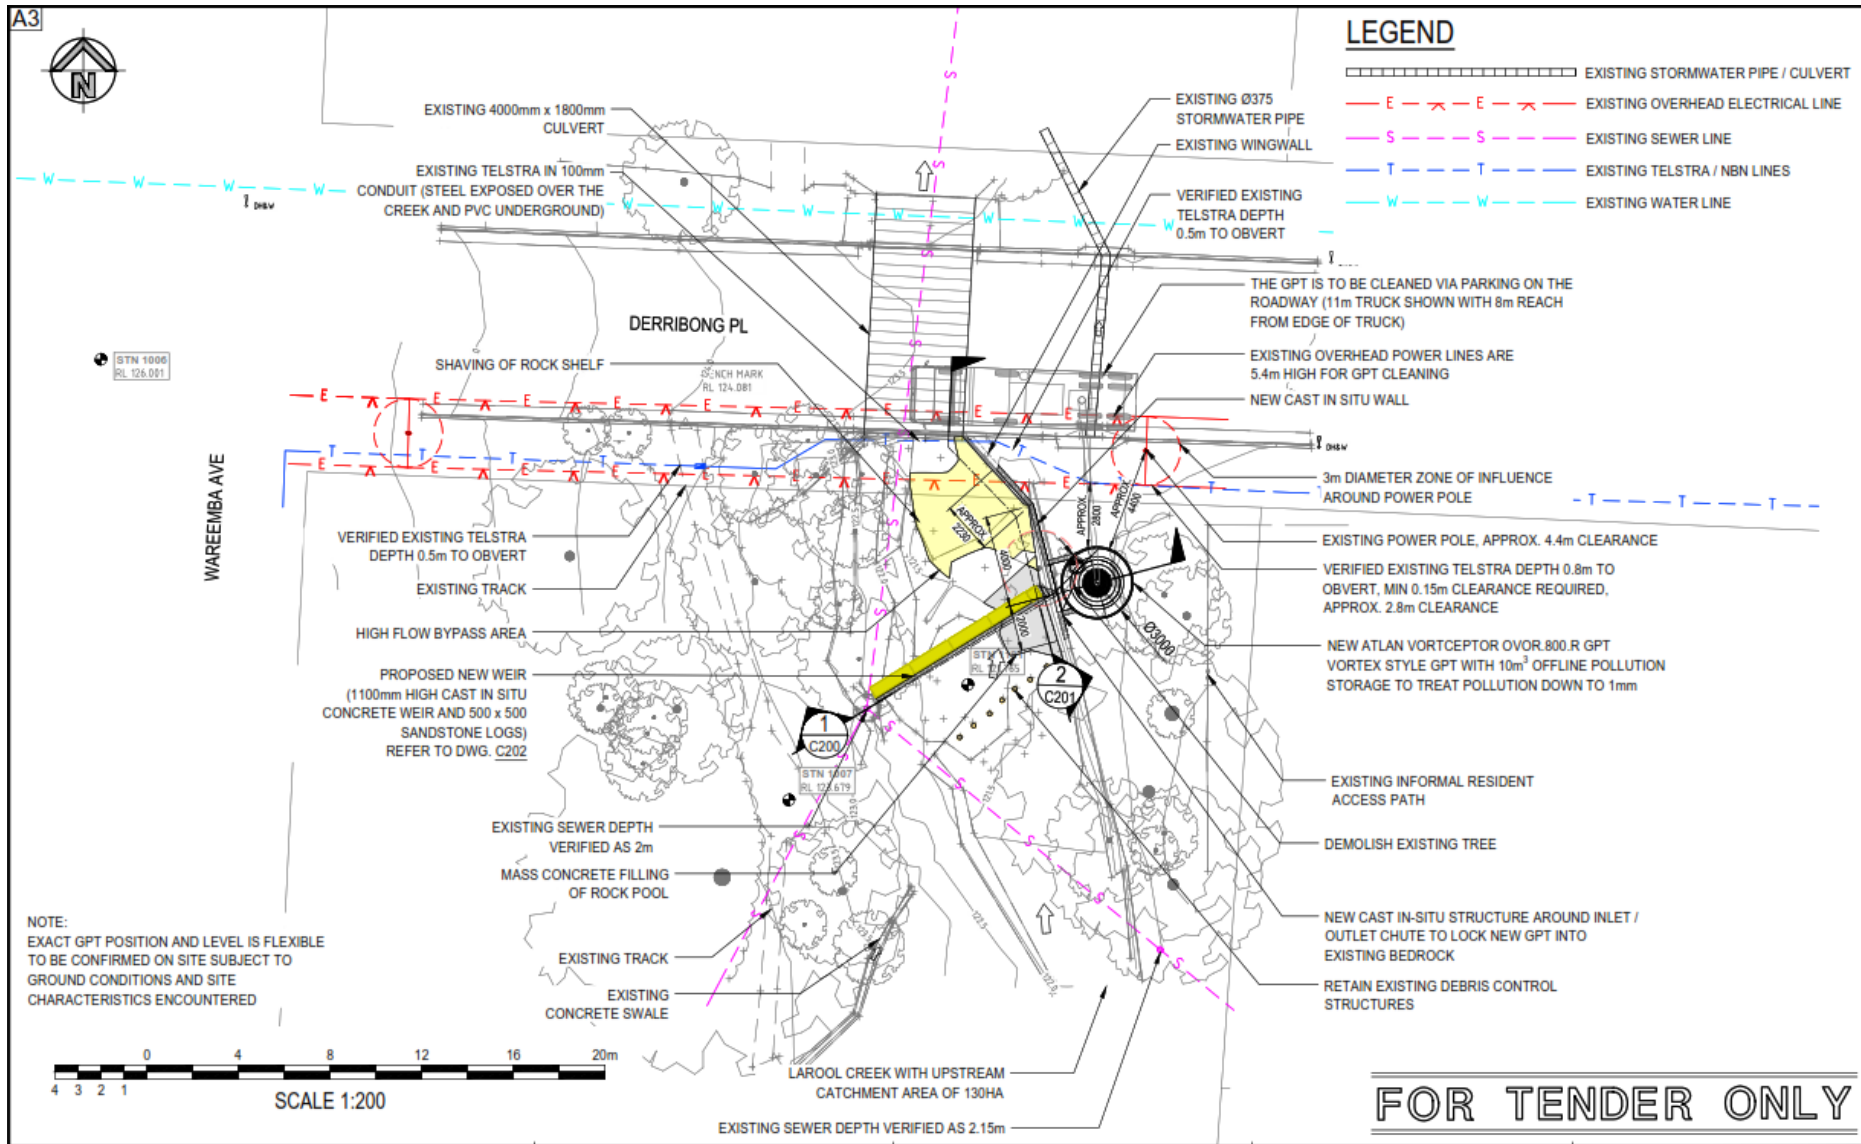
General arrangement of site elements (Optimal Stormwater 2024)
